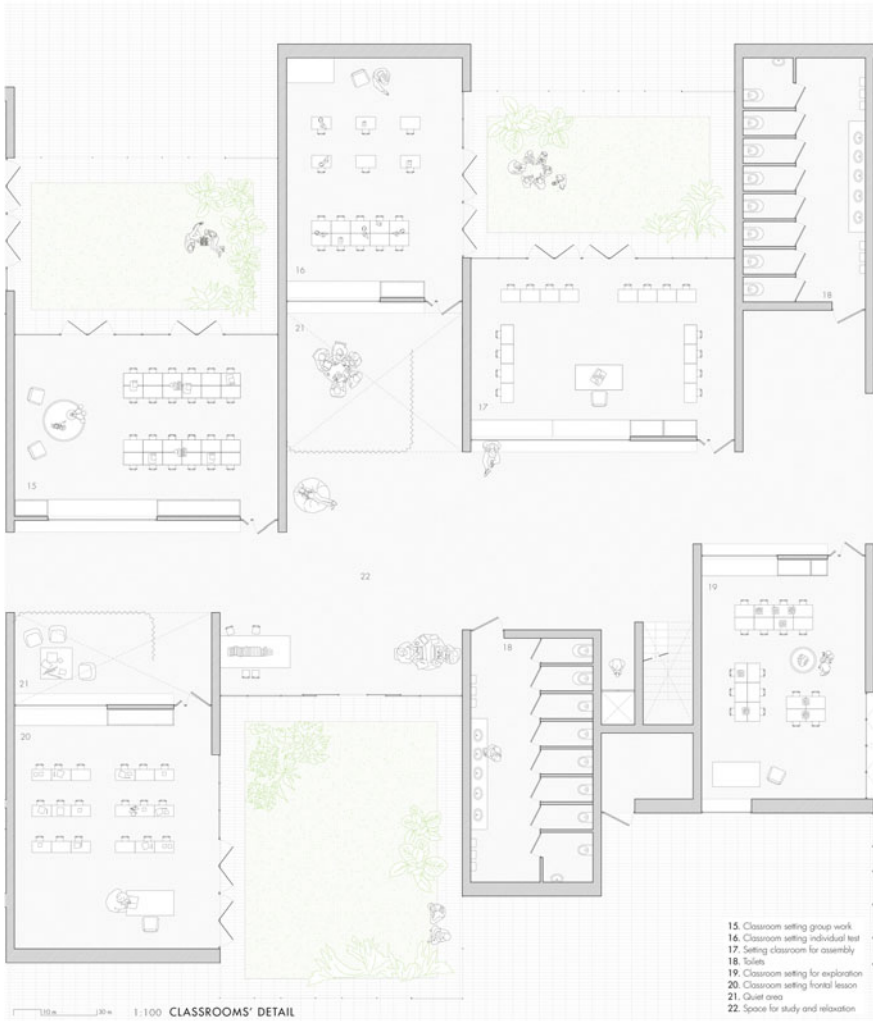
Ground floor plan of primary school: six types of setting and quiet areas
